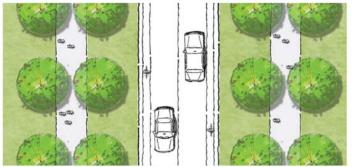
A Plan of typical two-lane Campus Greenbelt at Northwest of FIU Arena
